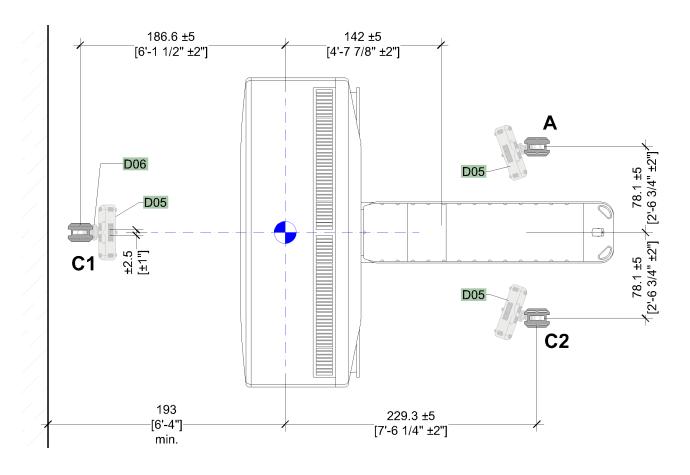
Halcyon GCX Ceiling Plate Positions
